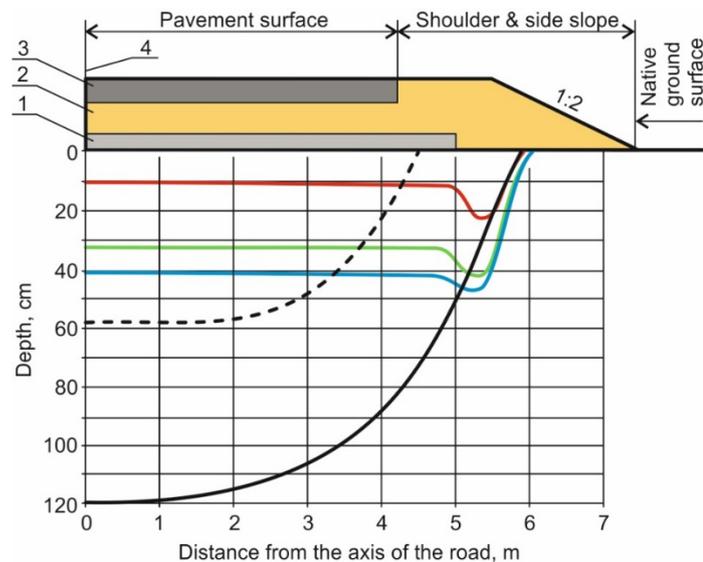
Road cross section and calculation results: 1 – Foam-glass ceramic layer (20 cm); 2 – Coarse sand layer (38 cm); 3 – Pavement: asphalt concrete and crushed stone (42 cm); 4 – Road axis. Red, green and blue lines correspond to $-0.5\text{ }^{\circ}\text{C}$ isotherms with λ 0.075, 0.111 and 0.137 W/(m \cdot $^{\circ}\text{C}$), respectively. Black solid and dotted lines correspond to -0.5 and $-2\text{ }^{\circ}\text{C}$ isotherms without insulating layer. The scale of the vertical axis is increased by 4 times for clarity.
